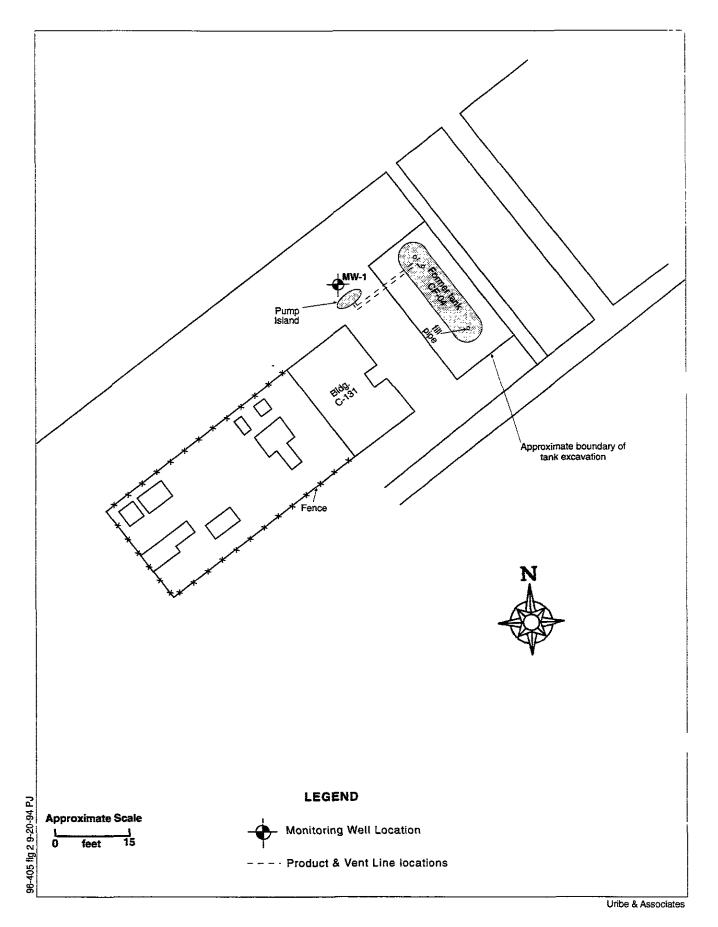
Site Plan, Berth 25, 707 Ferry Street, Oakland, California
